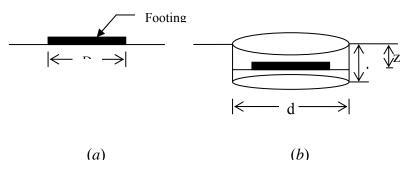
Geometric parameters of confined soil-foundation model; (a) Footing on silty sand ;(b) Footing on silty sand without confinement.
